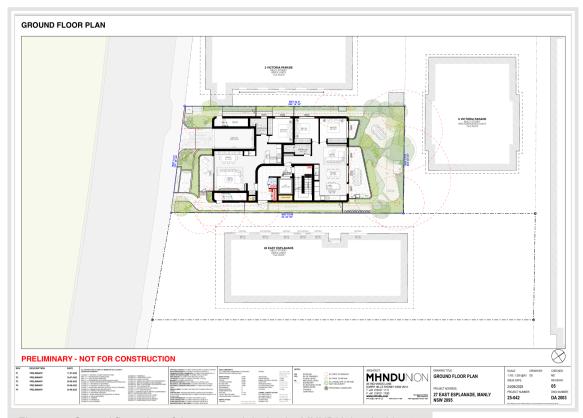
Ground floor plan of the proposed design by MHNDUnion Architects.
